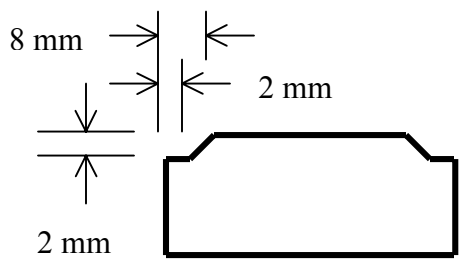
Critical dimensions of the concrete and clay paving tiles used to construct test surfaces.
